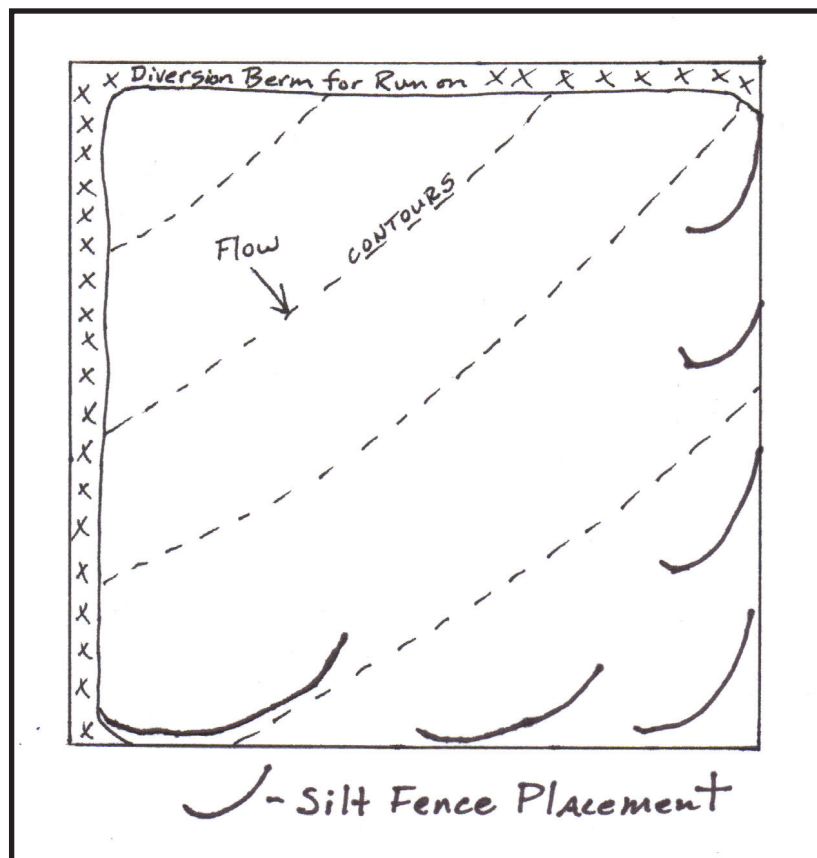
Placement of J-hook silt fence along the perimeter of a construction site to slow and pond small areas of stormwater runoff.
